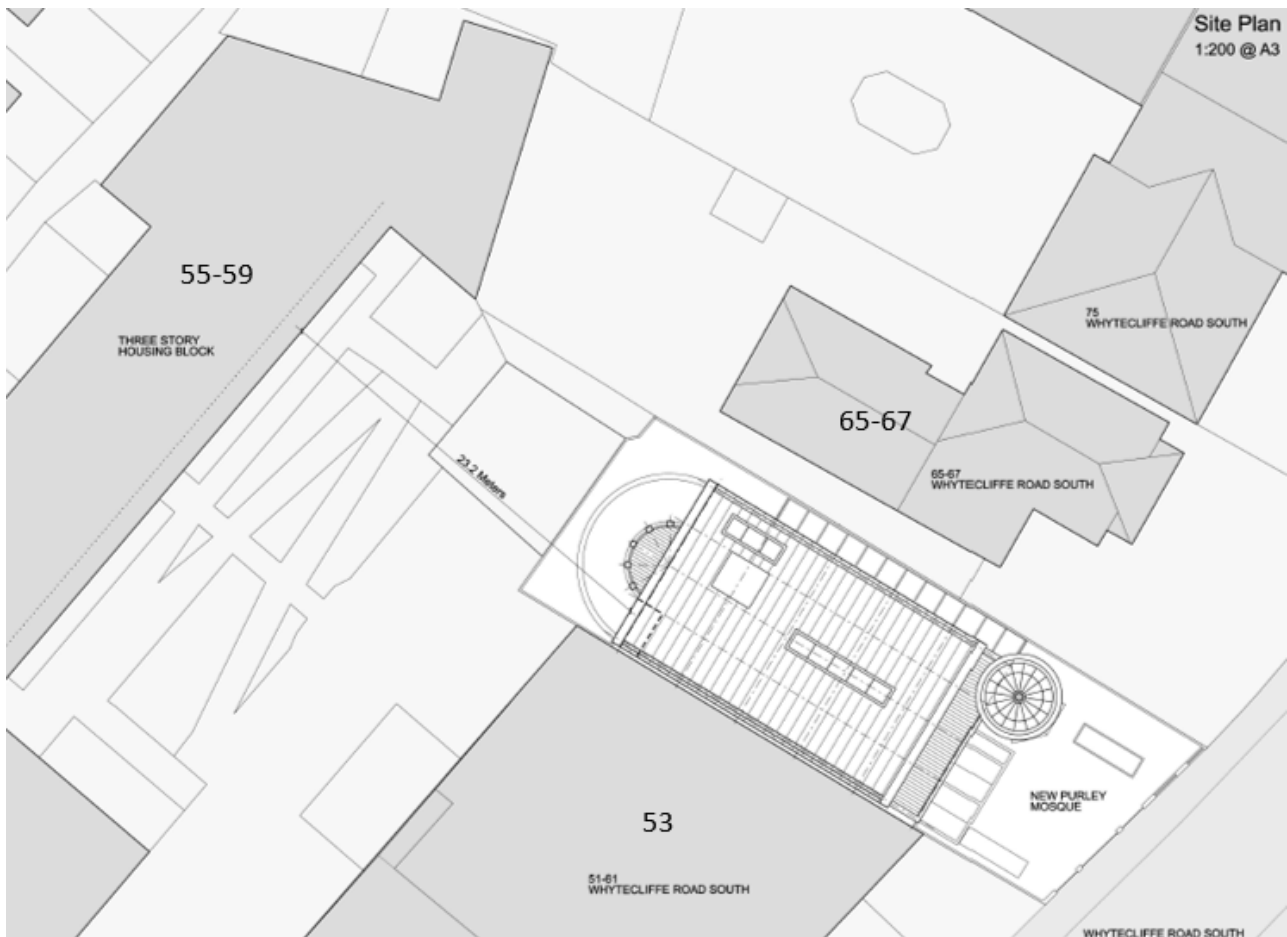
Plan highlighting the relationship with the adjoining occupiers.
